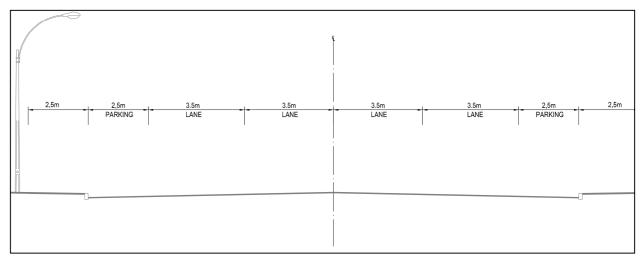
Typical existing 4 lane cross section in Modimolle
